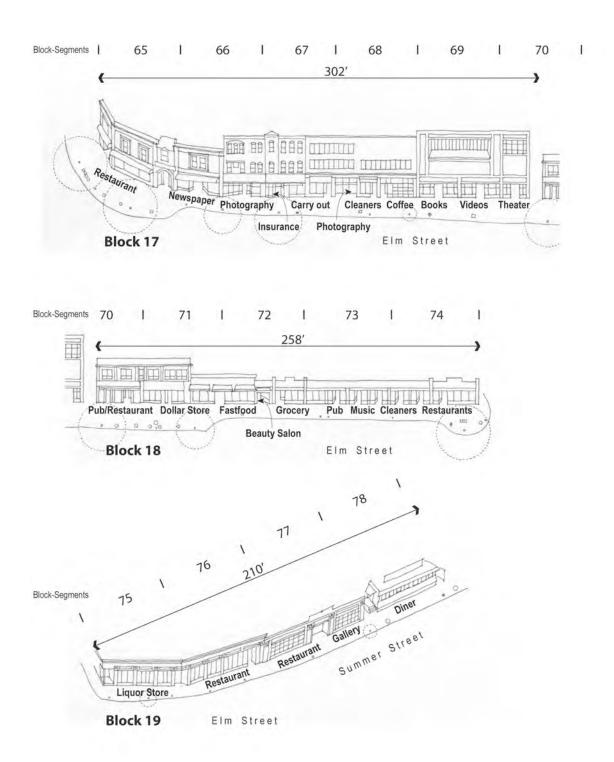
A combined plan and elevation of eight blocks studied on Elm Street (Continued from Figure 16)
